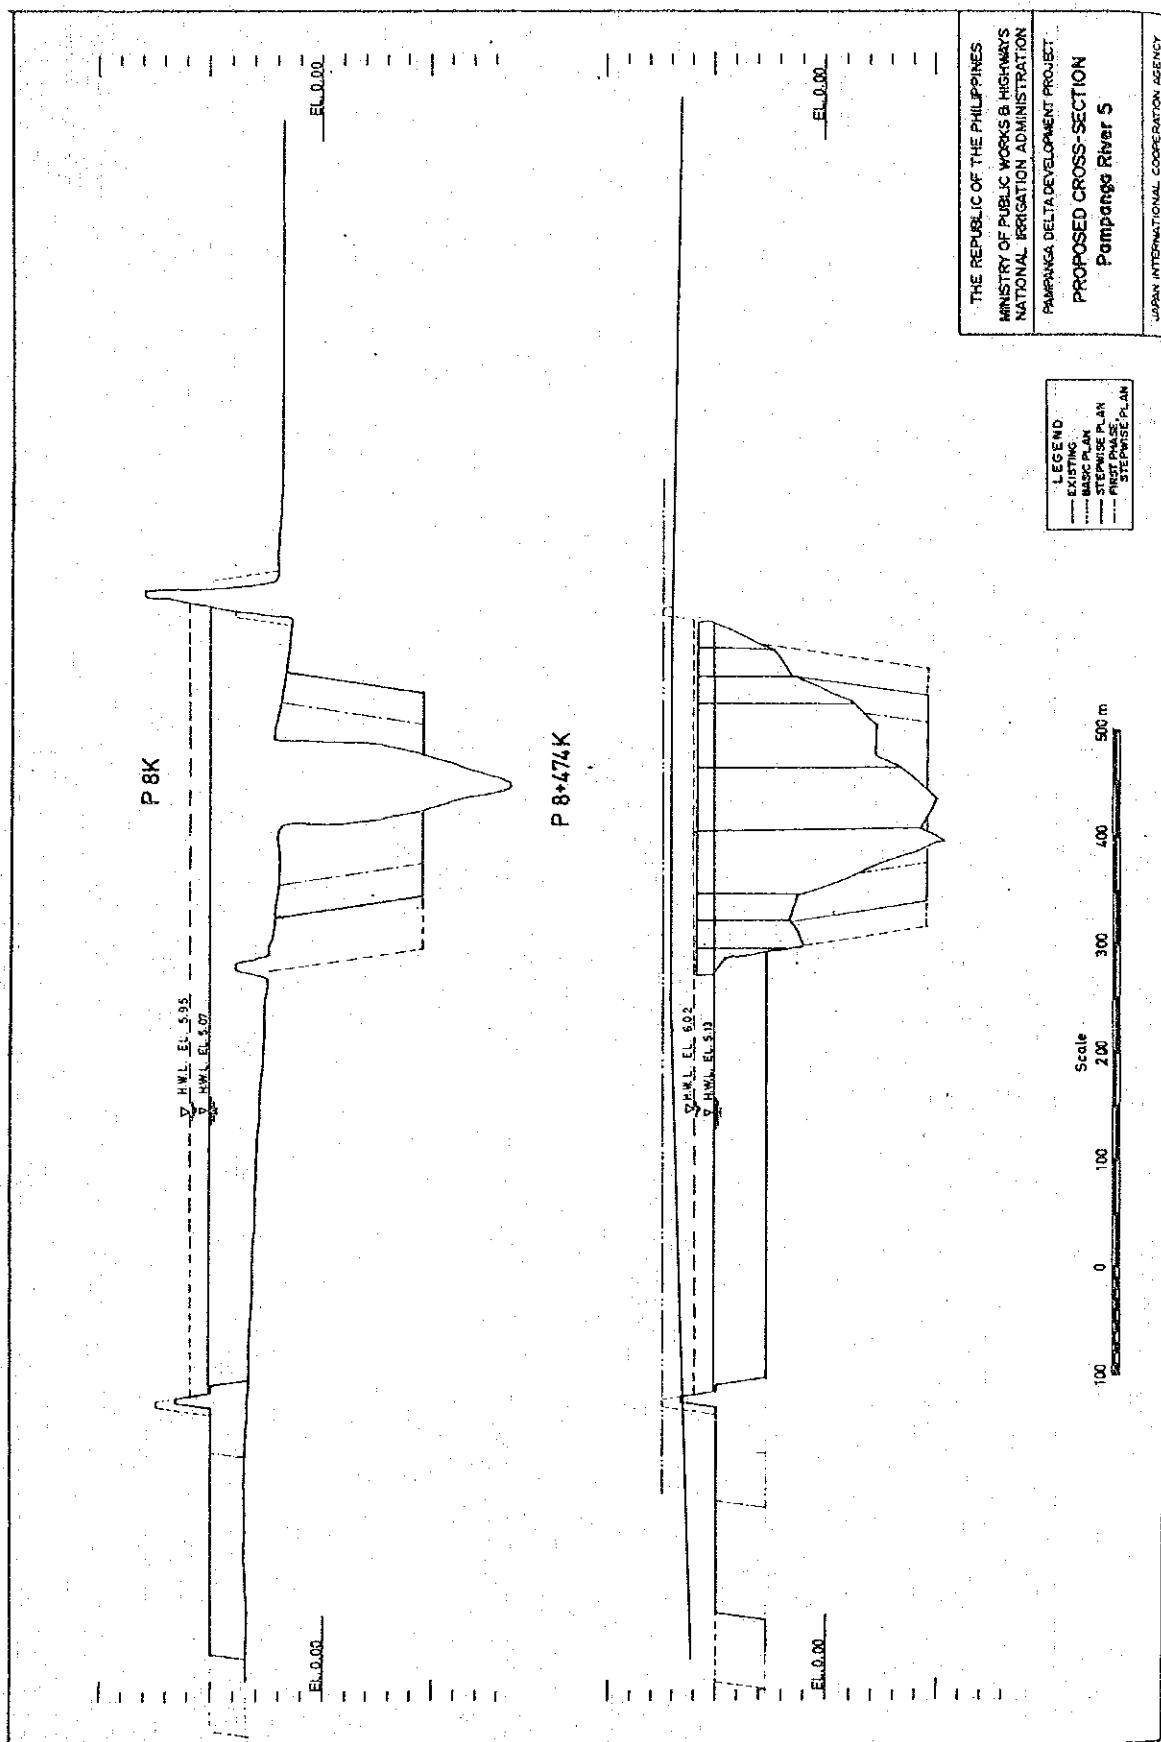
(6) PROPOSED CHANNEL CROSS-SECTION
